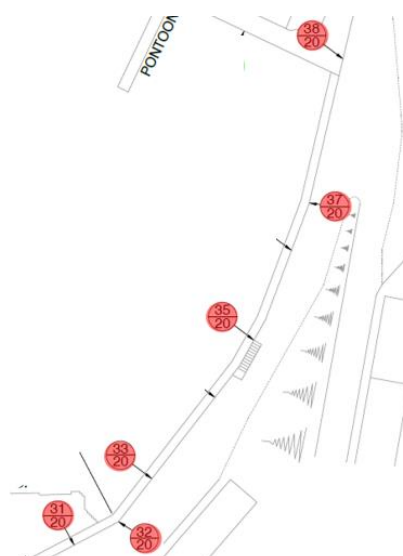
Repairs planned to Cullen Harbour 2024/25
